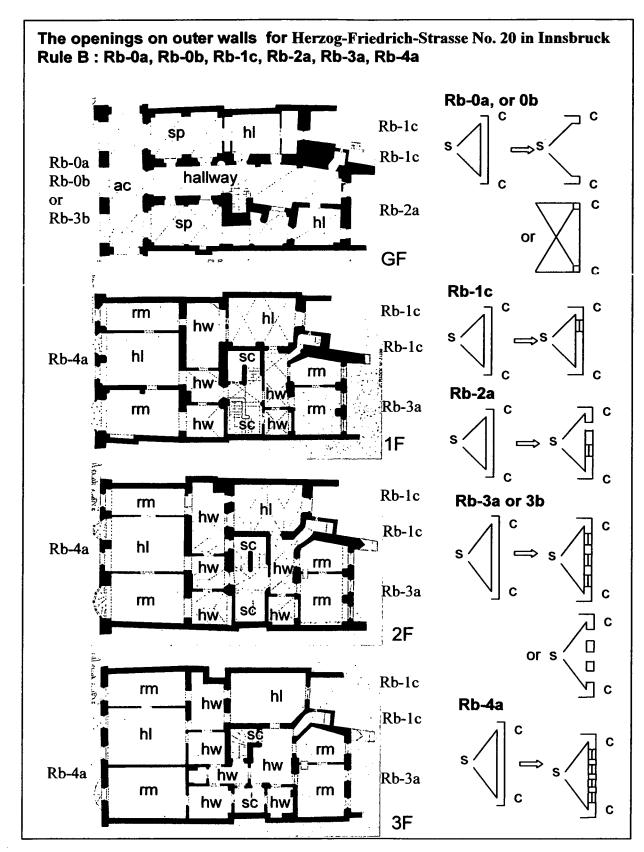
16 Rule B for floor plans at Herzog-Friedrich-Strasse No. 20 in Innsbruck
